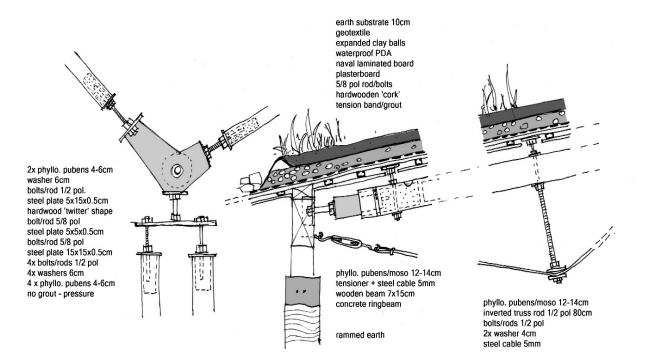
Schematic drawing of the twitter-bird connection and an inverted truss connection. 2020.
